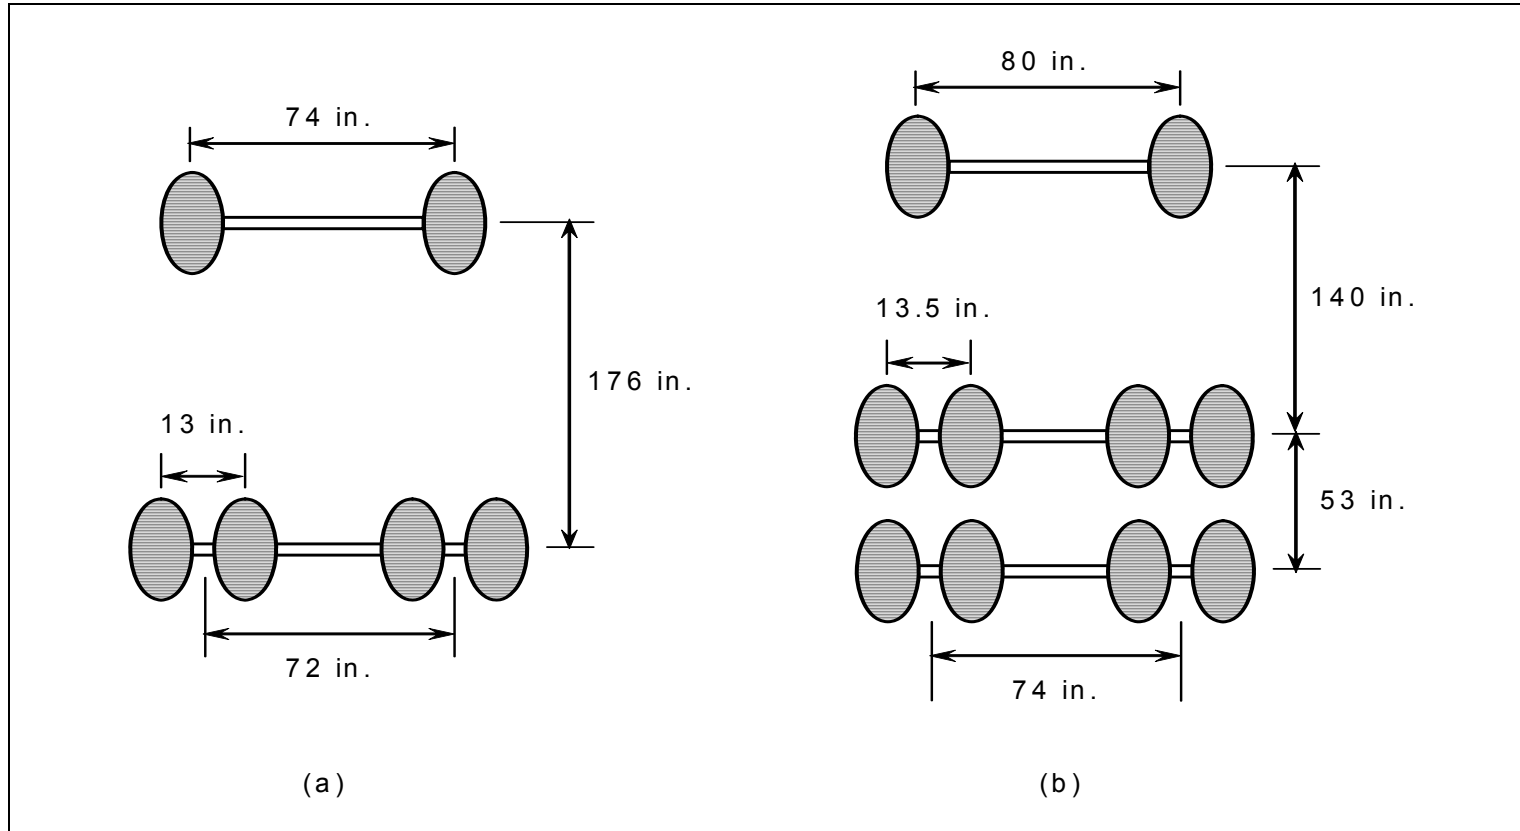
Footprint dimensions for the (a) flatbed CBR truck and the (b) emulsion truck
